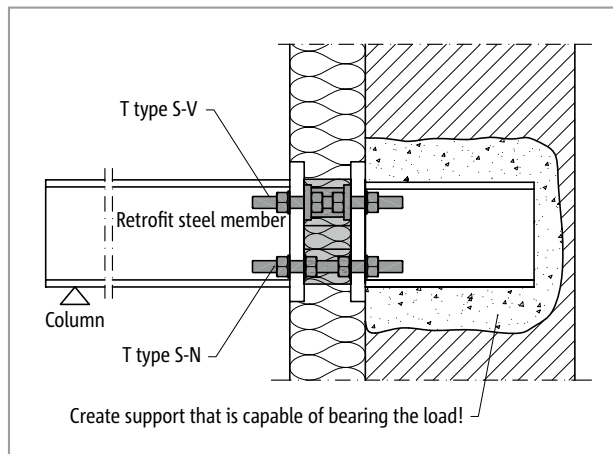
Schöck Isokorb® T type S-N and T type S-V for retrofitted supported steel structure; further examples of renovation see p. 90
